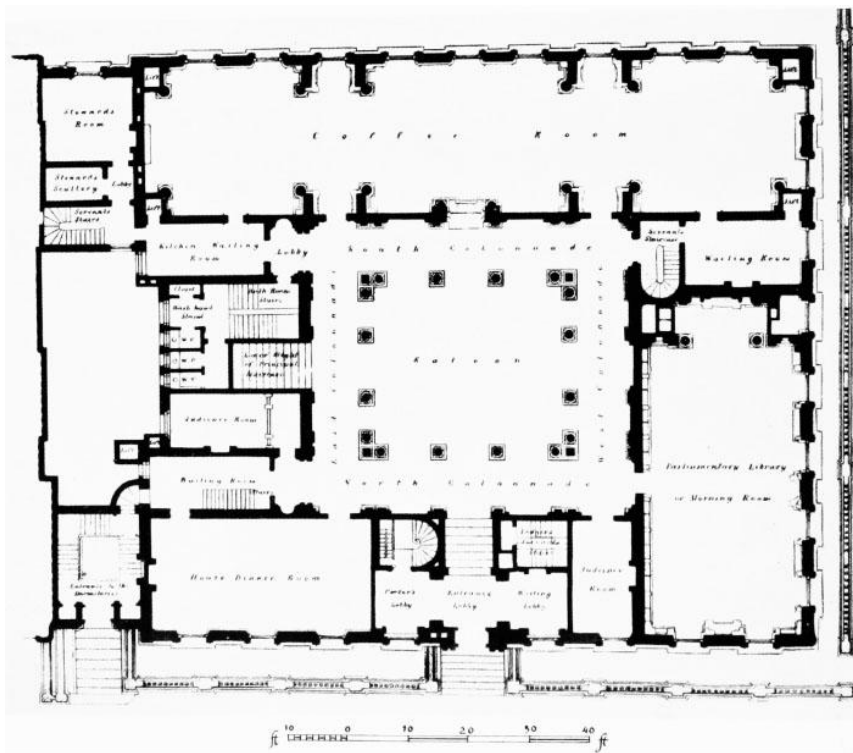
Reform Club, Ground-floor plan, executed design, published 1840. * First-floor unavailable. (*Survey of London*)
